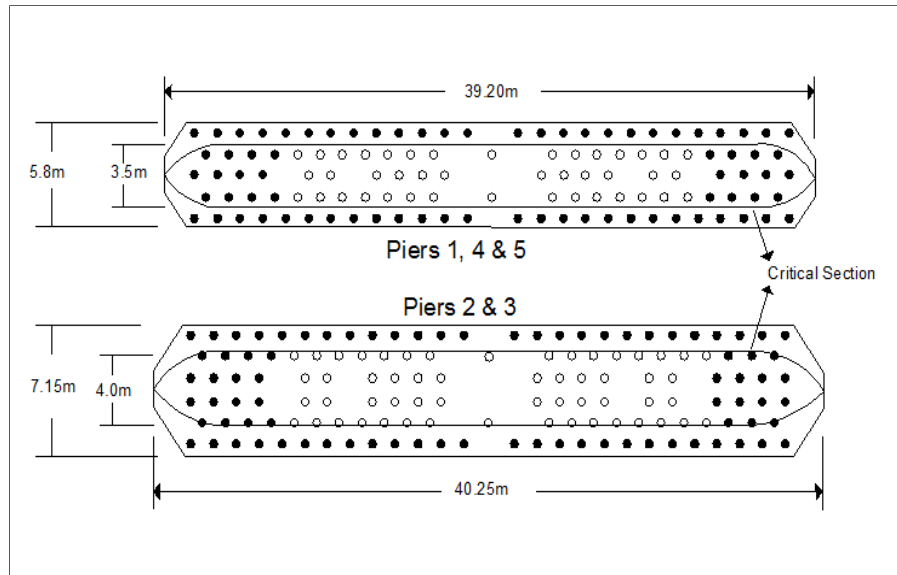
16. Plan view of pier's pile cap and pile configuration.
